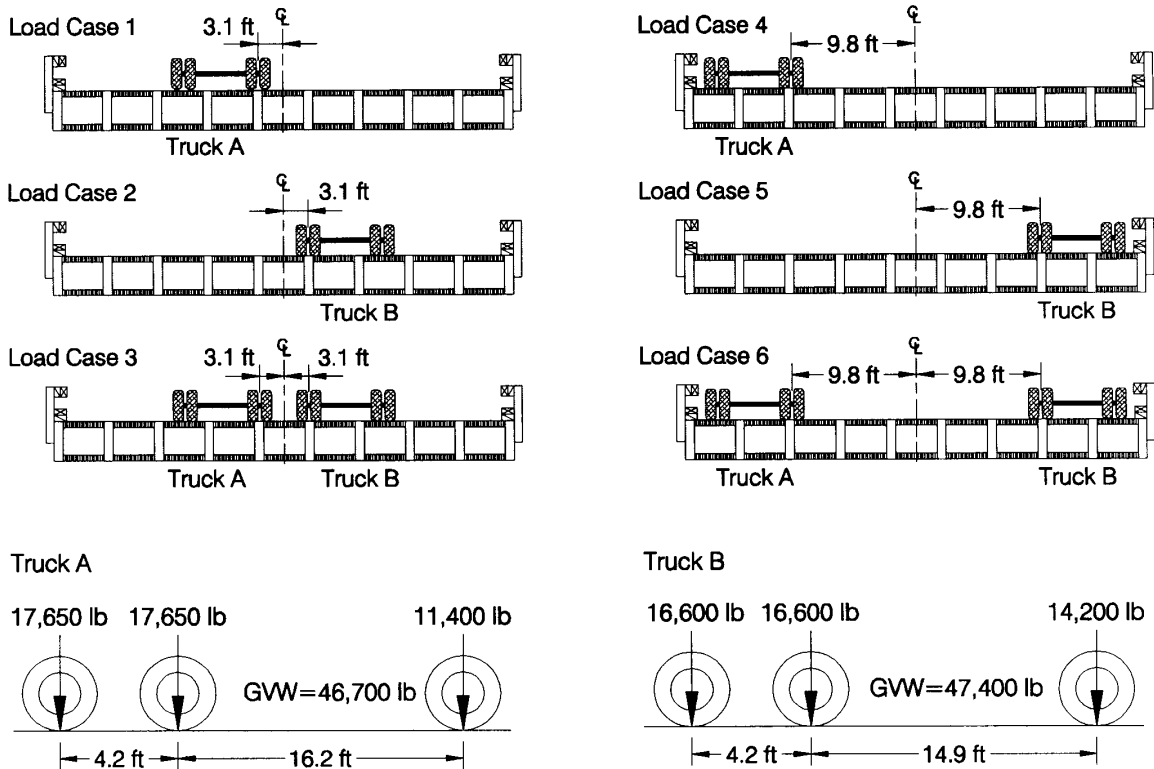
Load test 2 truck weights, axle spacings, and transverse load test positions.
